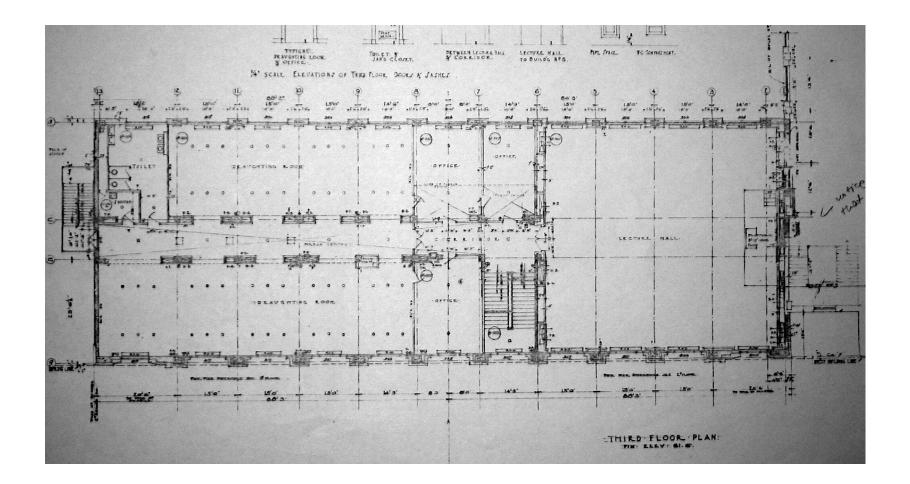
Photo of the Third Floor Plan of the Pratt School of Naval Architecture.
